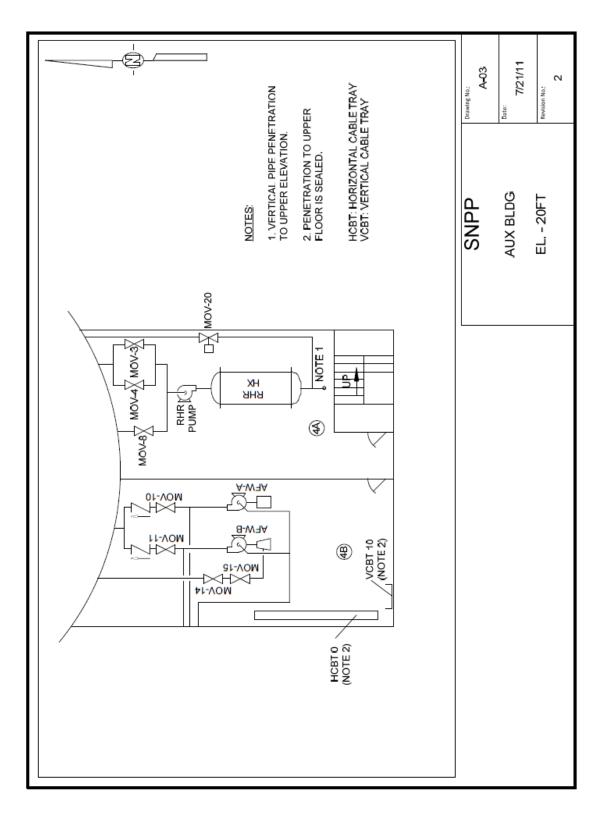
Auxiliary Building - Elevation 20 Ft.
